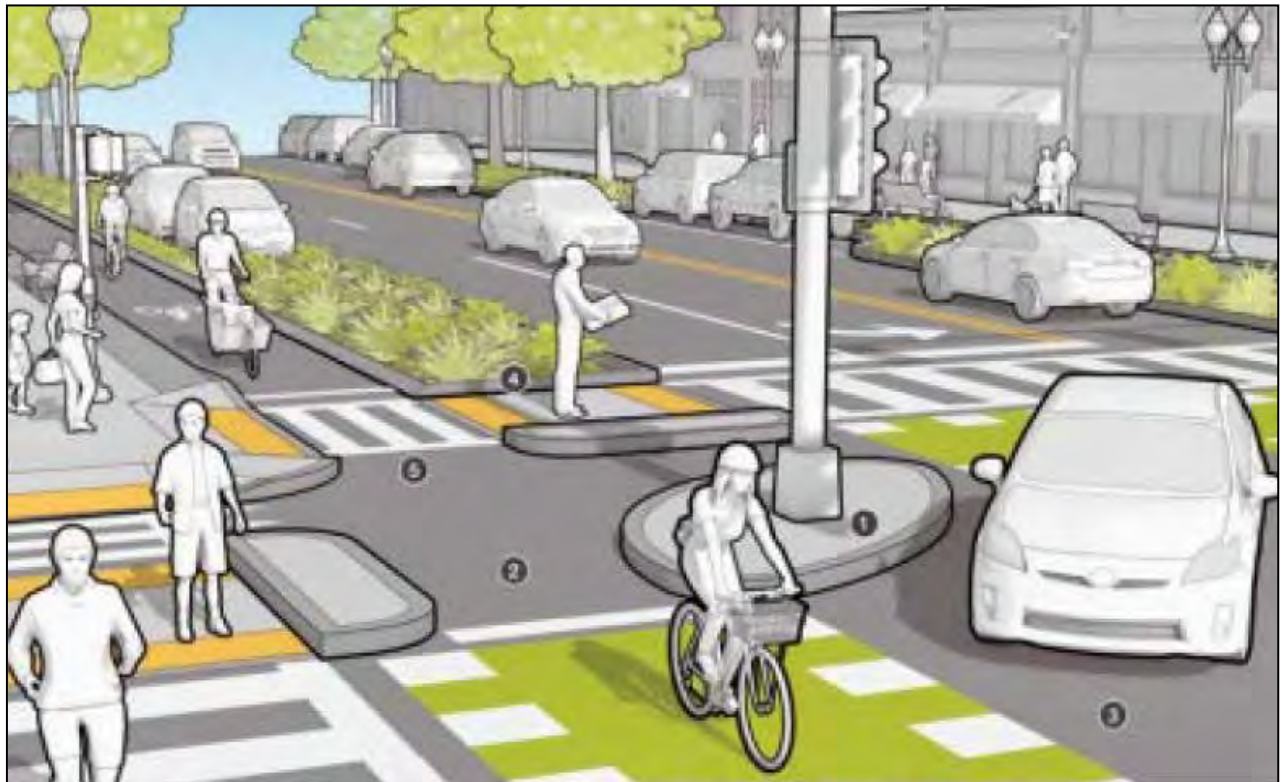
Protected Bikeway Intersection (Source: MassDOT)
